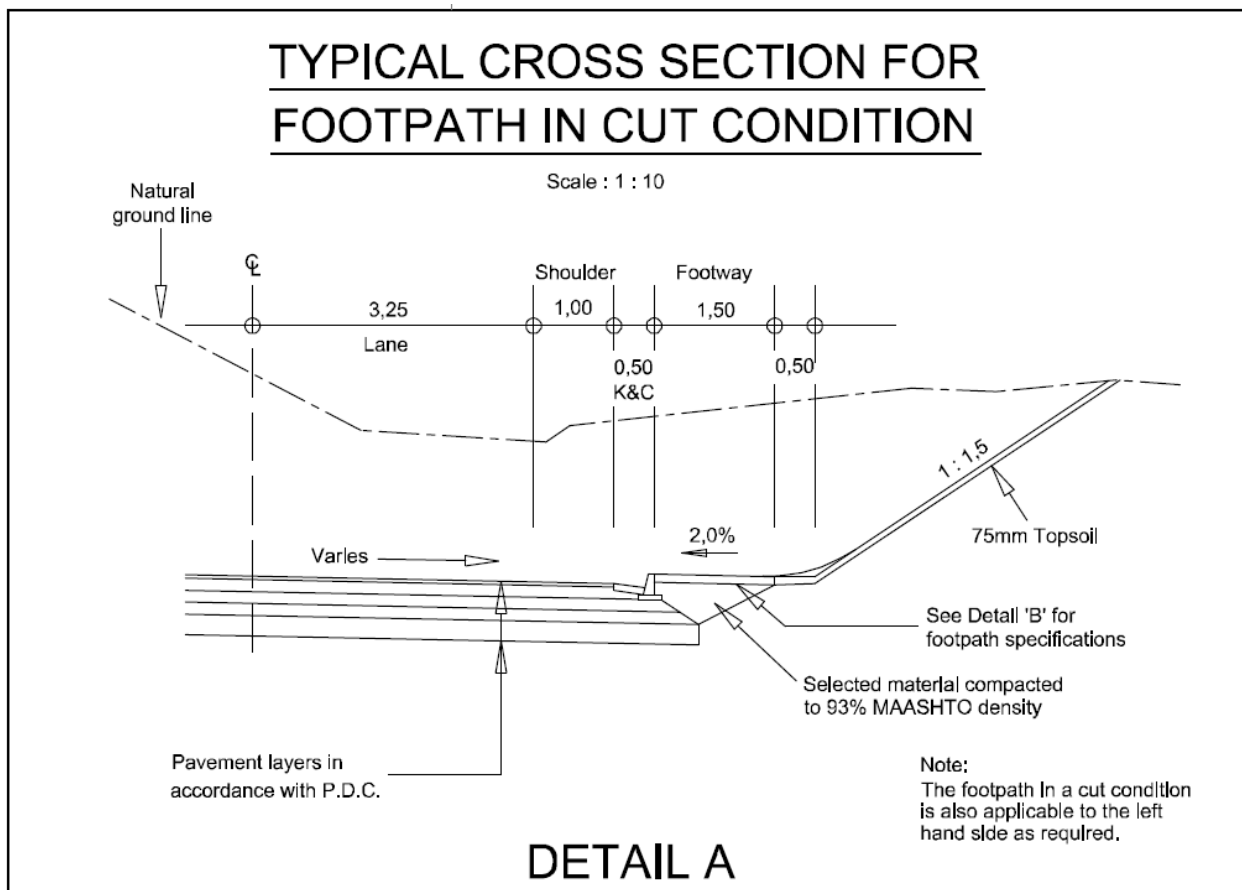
Typical cross section for footpath in a cut condition (Refer to Appendix B1 for the full design drawing).
